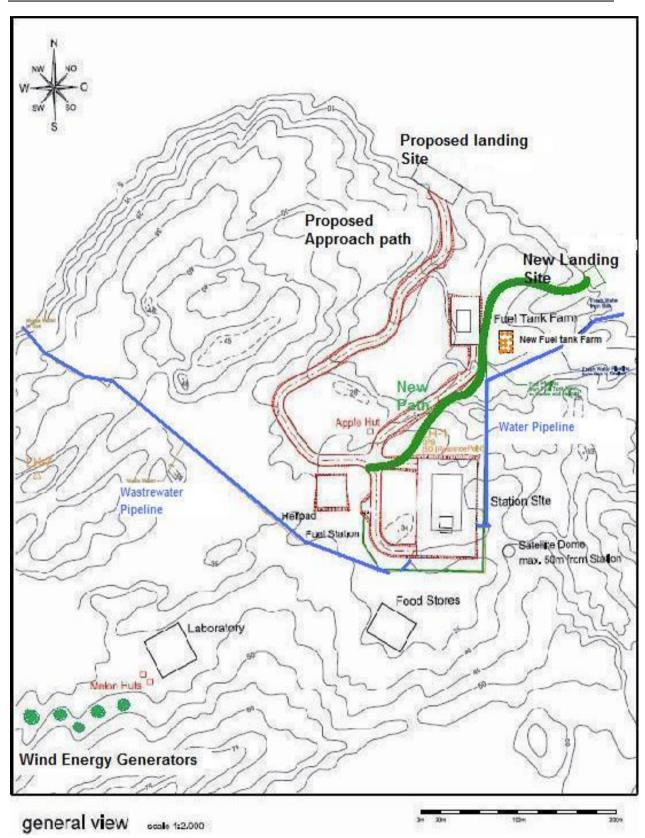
LAYOUT PLAN OF THE STATION BUILDING AND OTHER INFRASTRUCTURE
